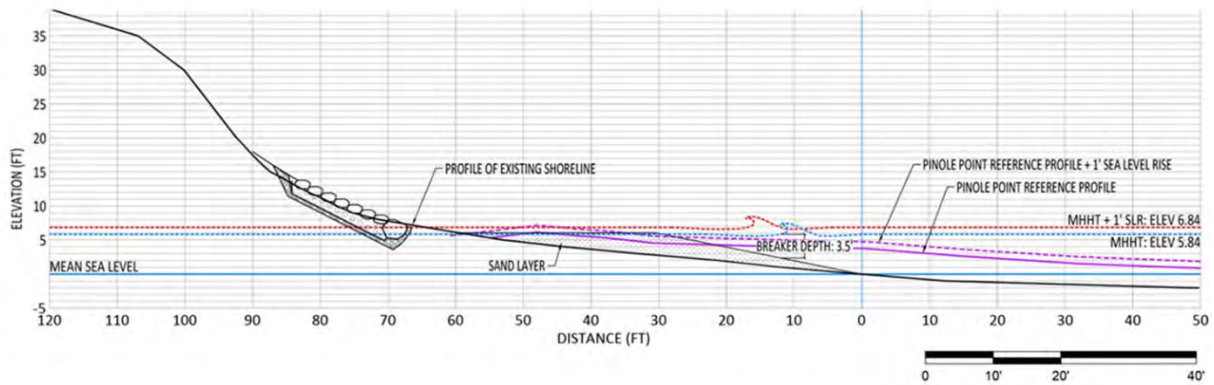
Plots of beach design 2 for transect C with the proposed 3 alternative bluff stabilization plans by Anchor QED (2020).
